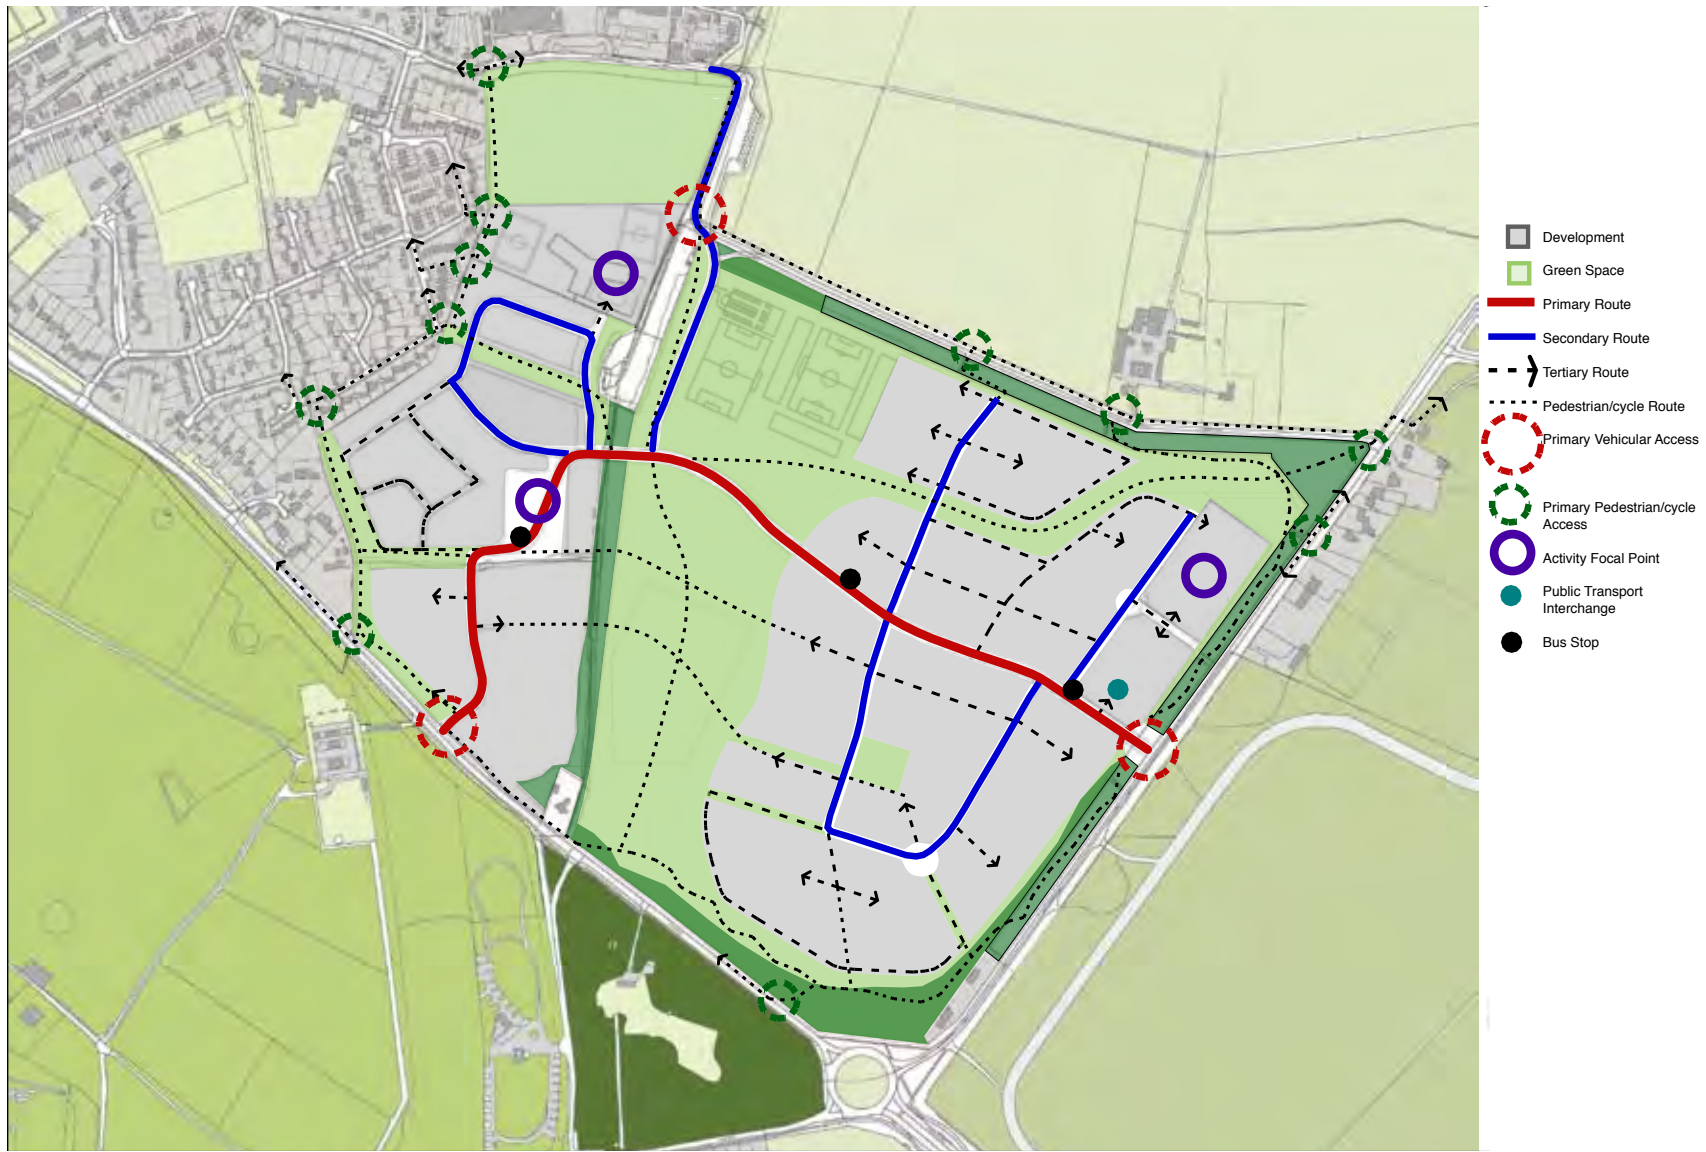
| ACCESS AND MOVEMENT PARAMATER PLAN
